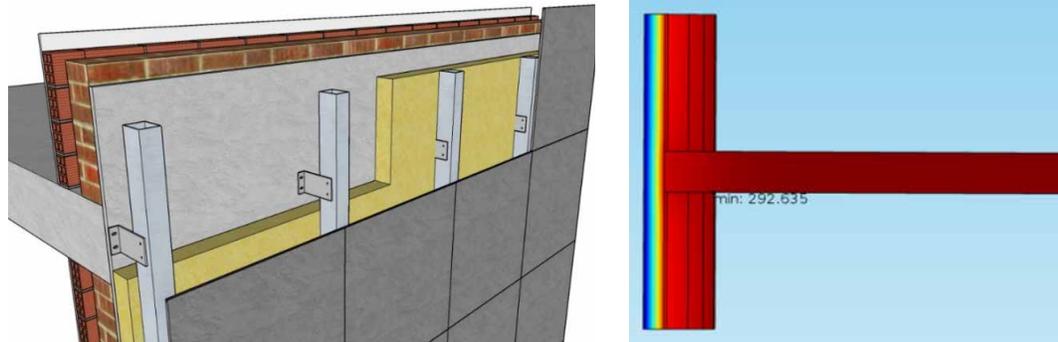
Architectural detail and thermal field in the cross-section of the slab-façade junction
